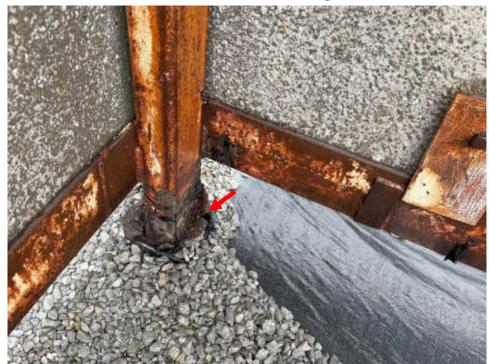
Typical Corrosion at Structural Framing for Roof Level Precast Screen. Potential Section Loss at Roof Pitch Pocket Flashing Detail
